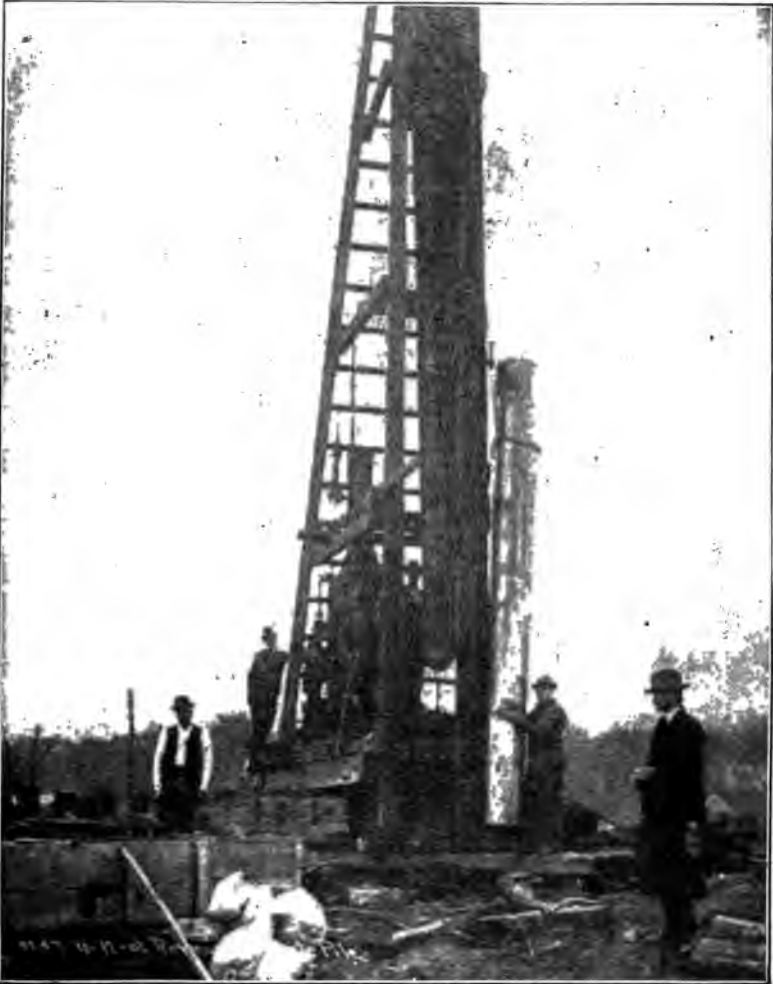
Core and Shell of Raymond Concrete Pile.
